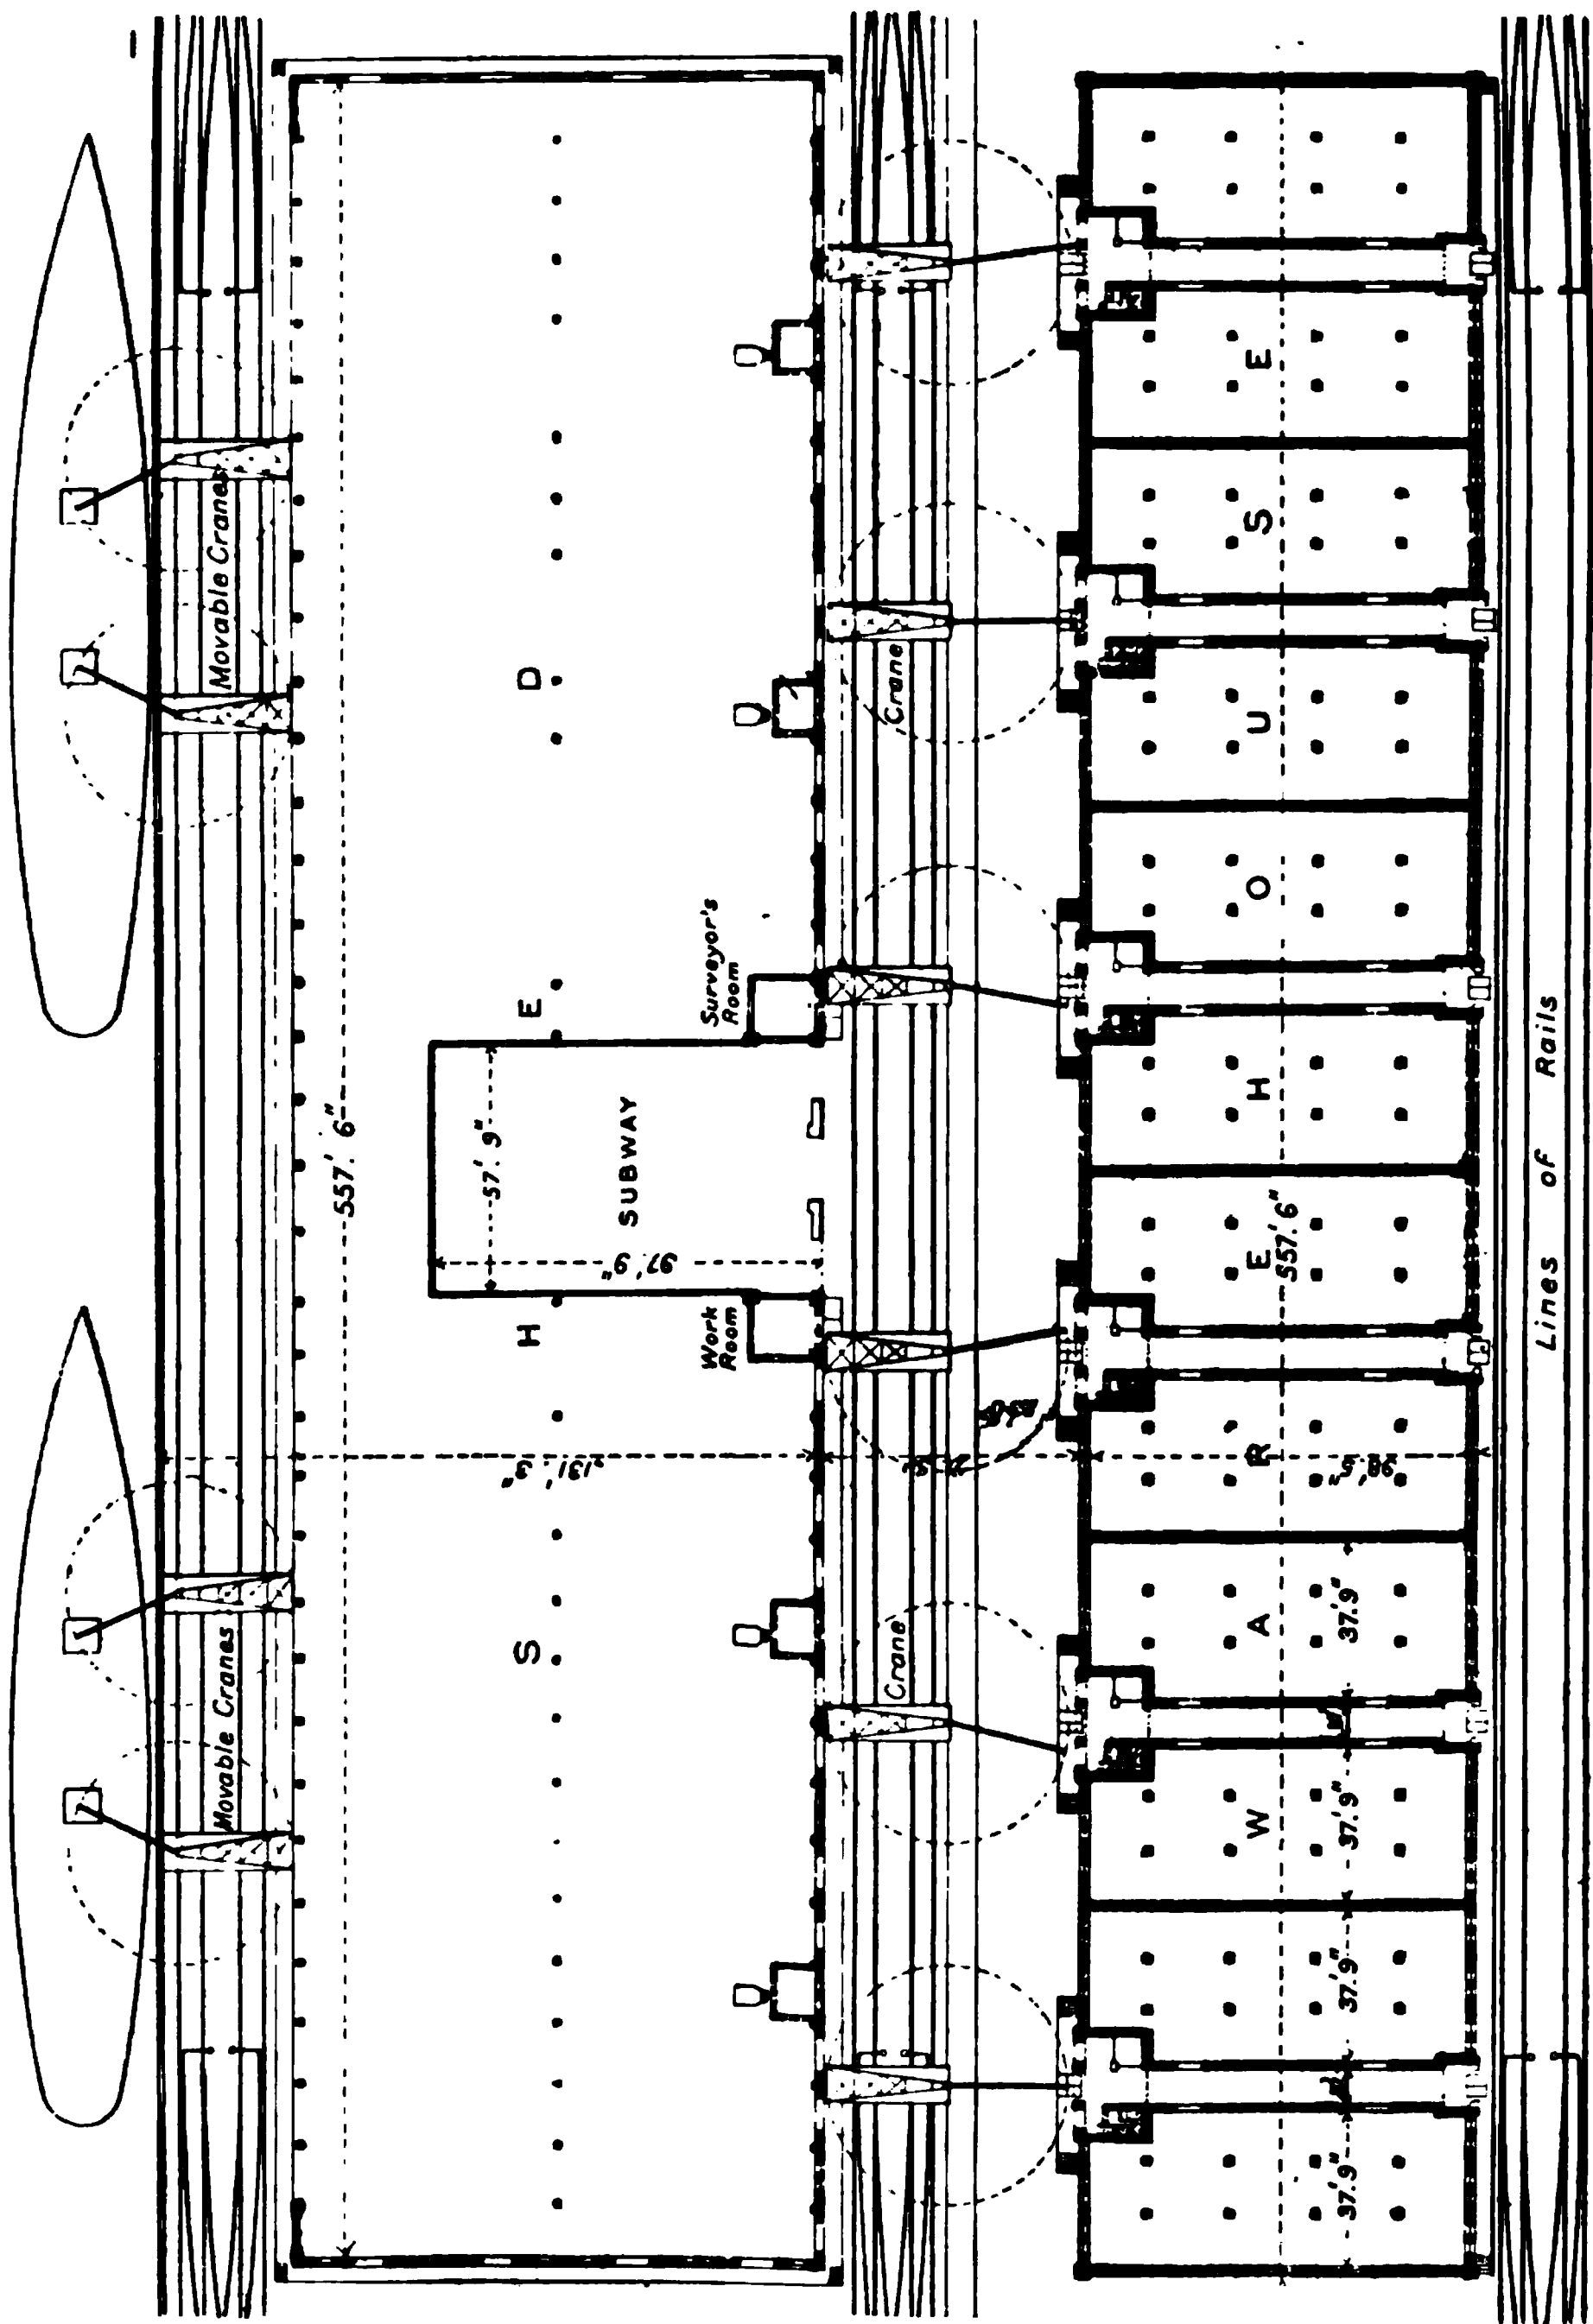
Plan of Shed and Warehouse at Bremen.
